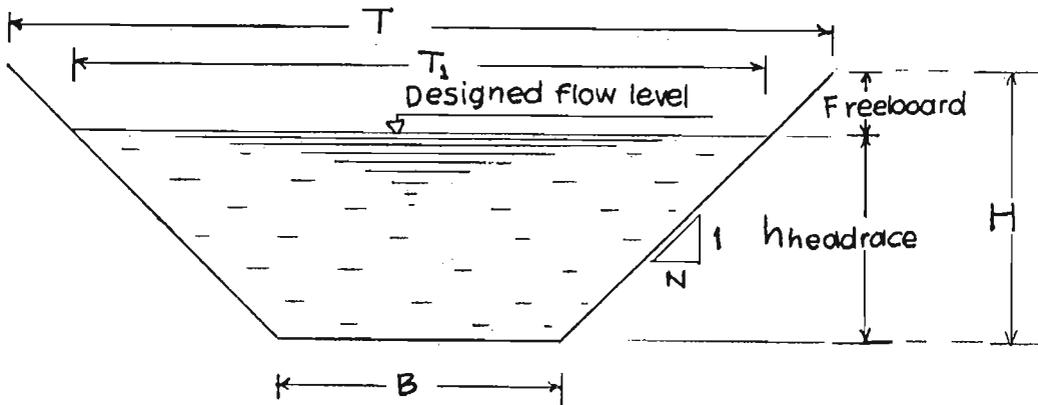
Headrace Canal with Trapezoidal Cross-Section
